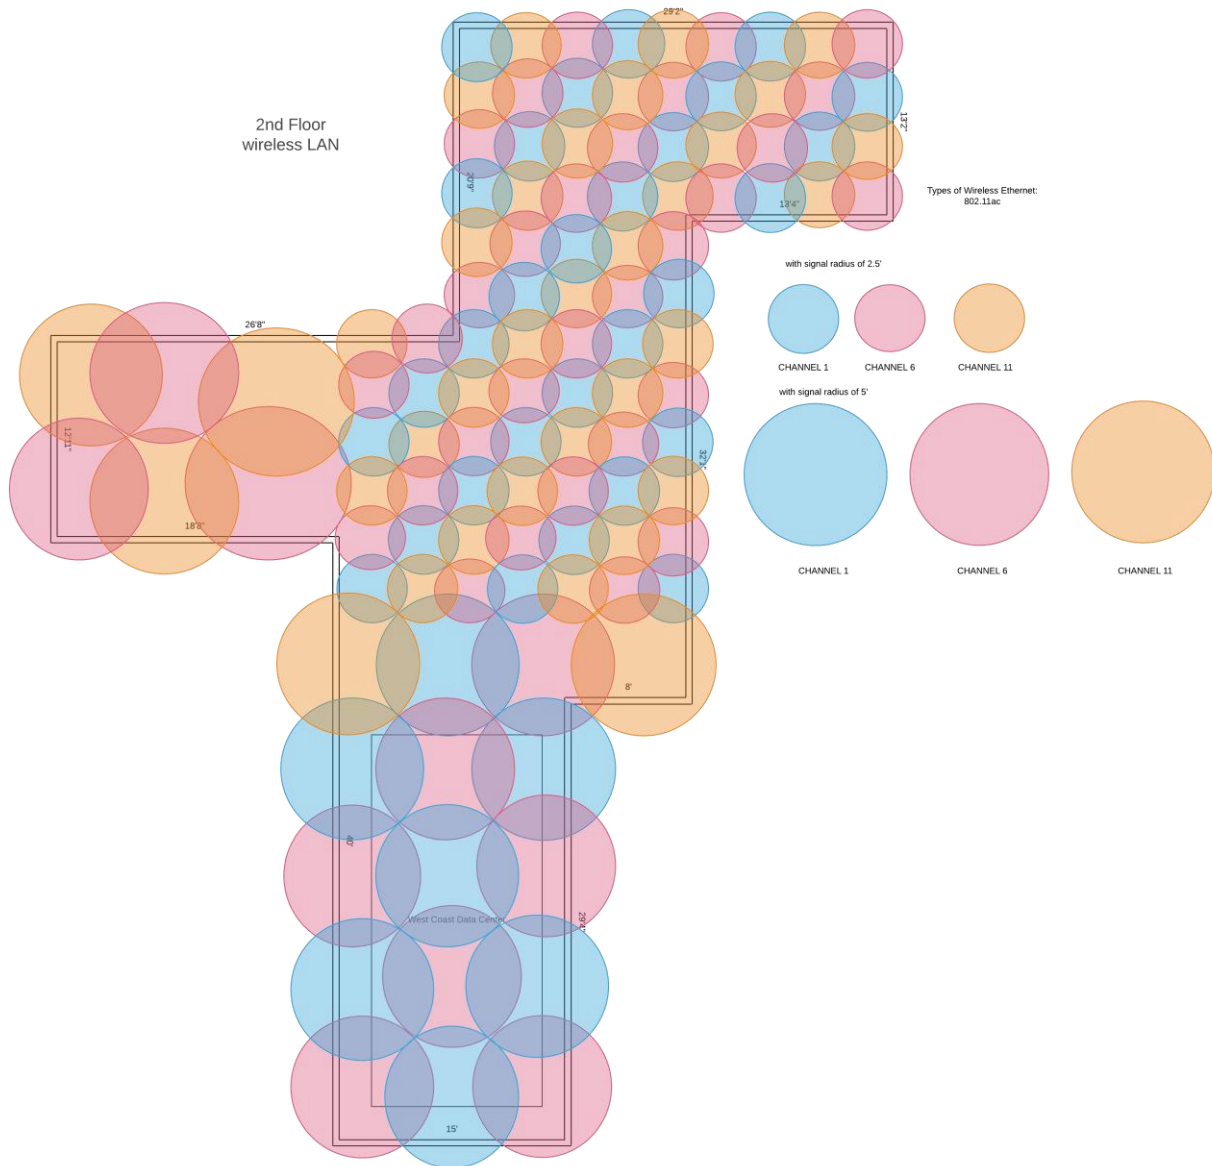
Wi-Fi Signal distribution of second floor of main building
